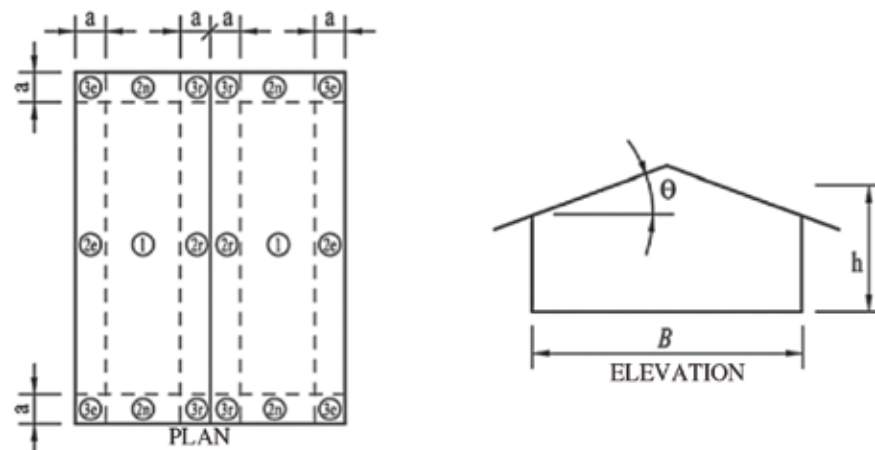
Example of ASCE 7-16 Sloped Roof Component & Cladding Zoning for 7 to 20 degree roof slopes. Printed with permission from ASCE. See ASCE 7-16 for important details not included here.
